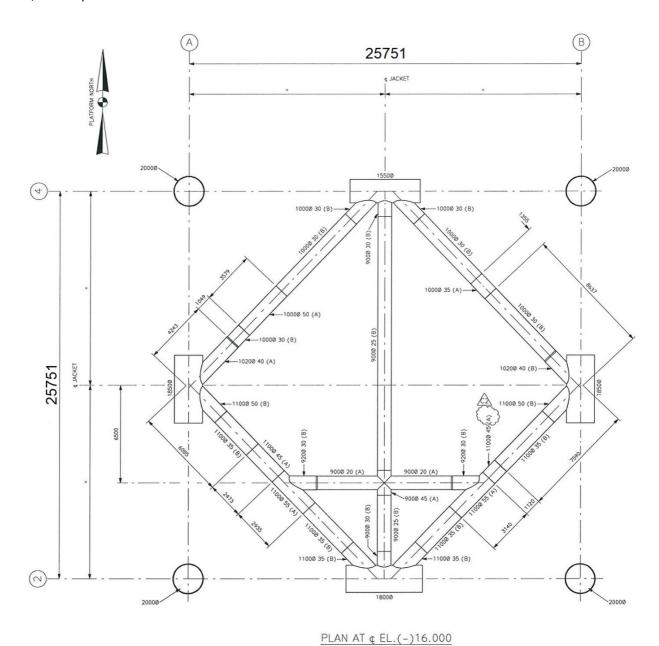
Solan jacket bracing plan at EL. -16.000
